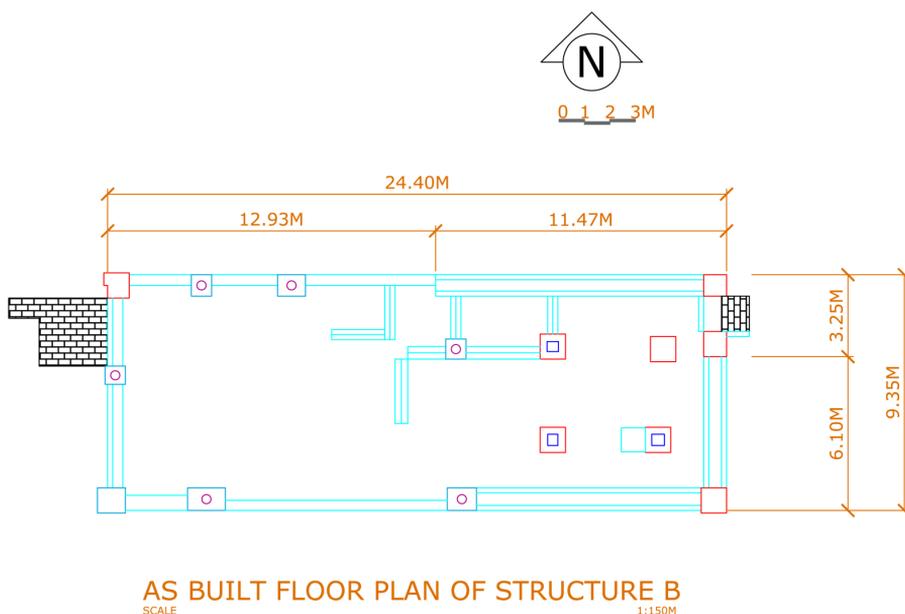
Structure B's floor plan based on the 2011 excavation (Prepared by Angel Sales from UP-ASP 2011).
